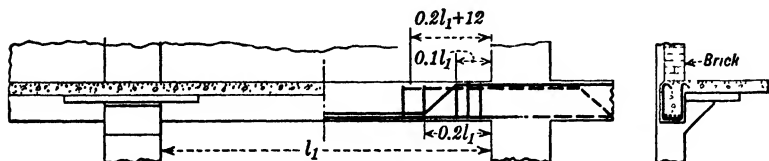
Wall Beams below Slab. (See p. 379.)
